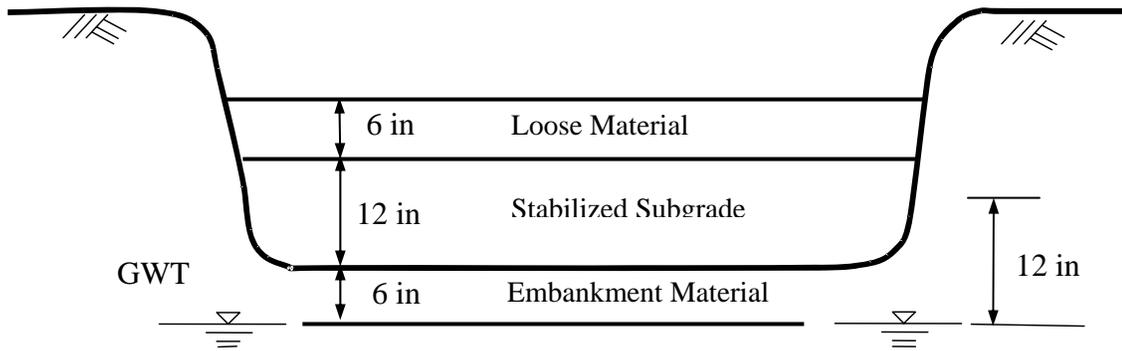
Schematic Site Plan for Compaction of Case A4 (Lake Worth Site)
